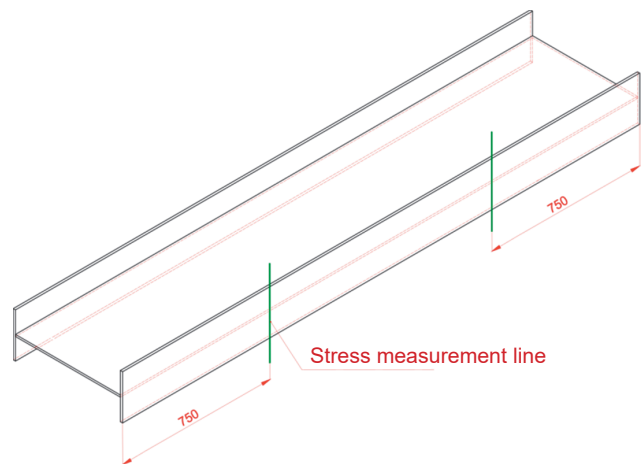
Arrangement of measurement lines on the double T-bar flange surface
